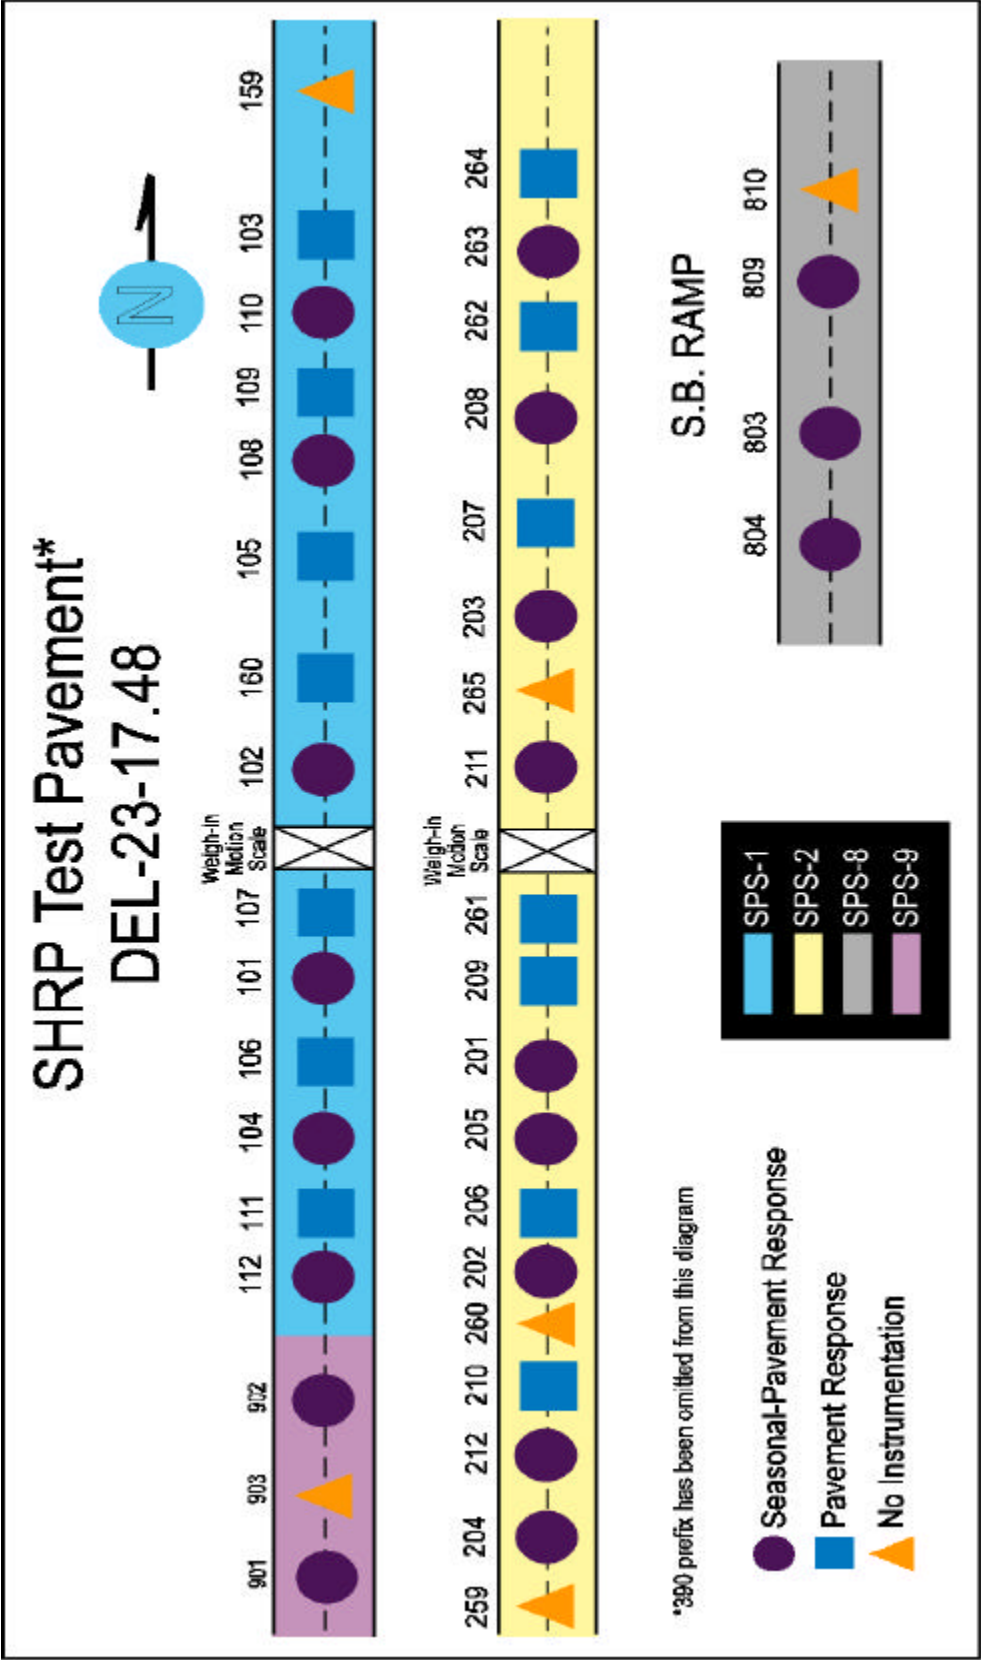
Layout of the Ohio SHRP Test Pavement
